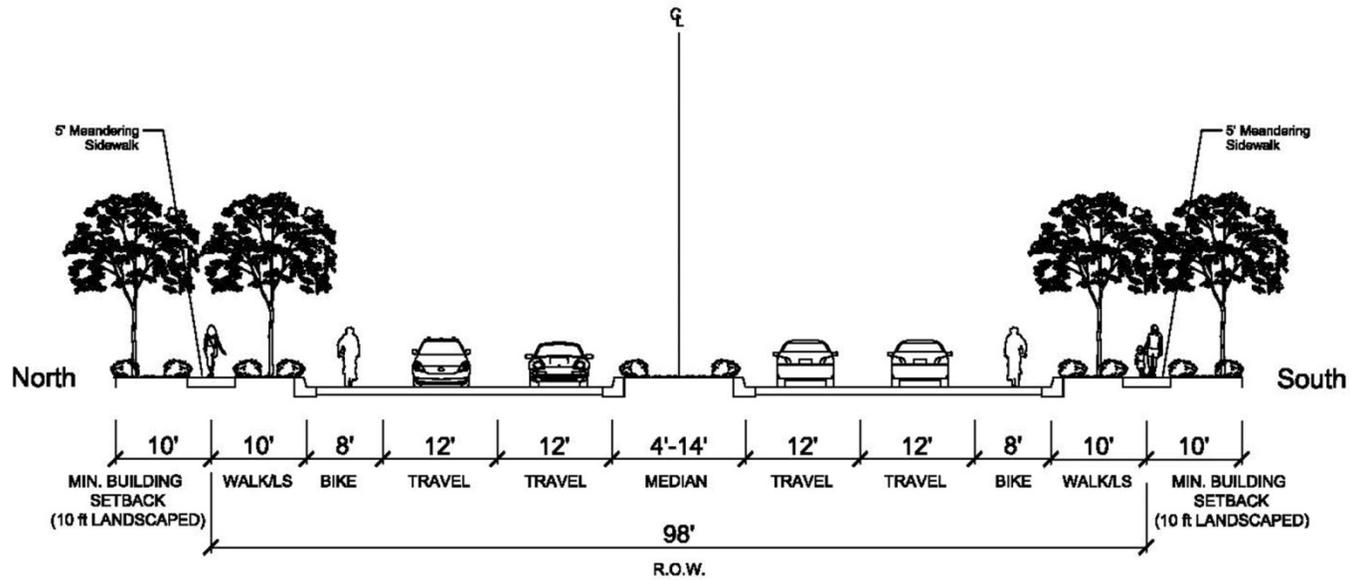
Victory Road – Eastbound from Tustin Ranch Road to Park Avenue
